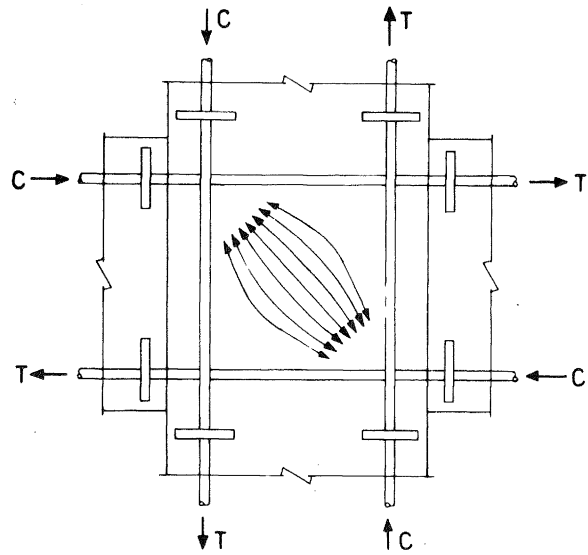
DIAGONAL STRUT ACTION FOR BOND PLATE SPECIMENS
